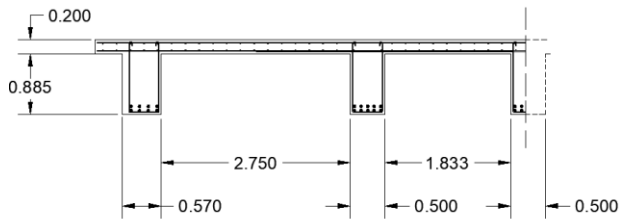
Cross-section of the outer part of the bridge (dimensions in m)
